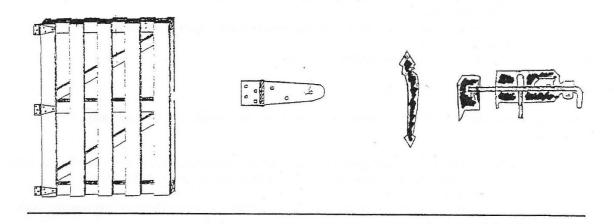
FIGURE B TYPICAL ELEVATION OF AN END UNIT
